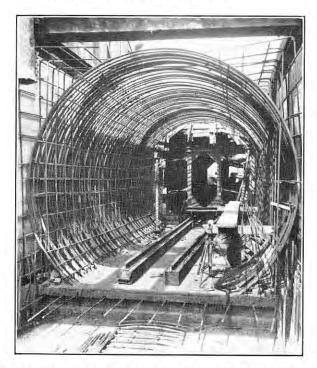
Construction of Cooling-Water Delivery Culvert.
